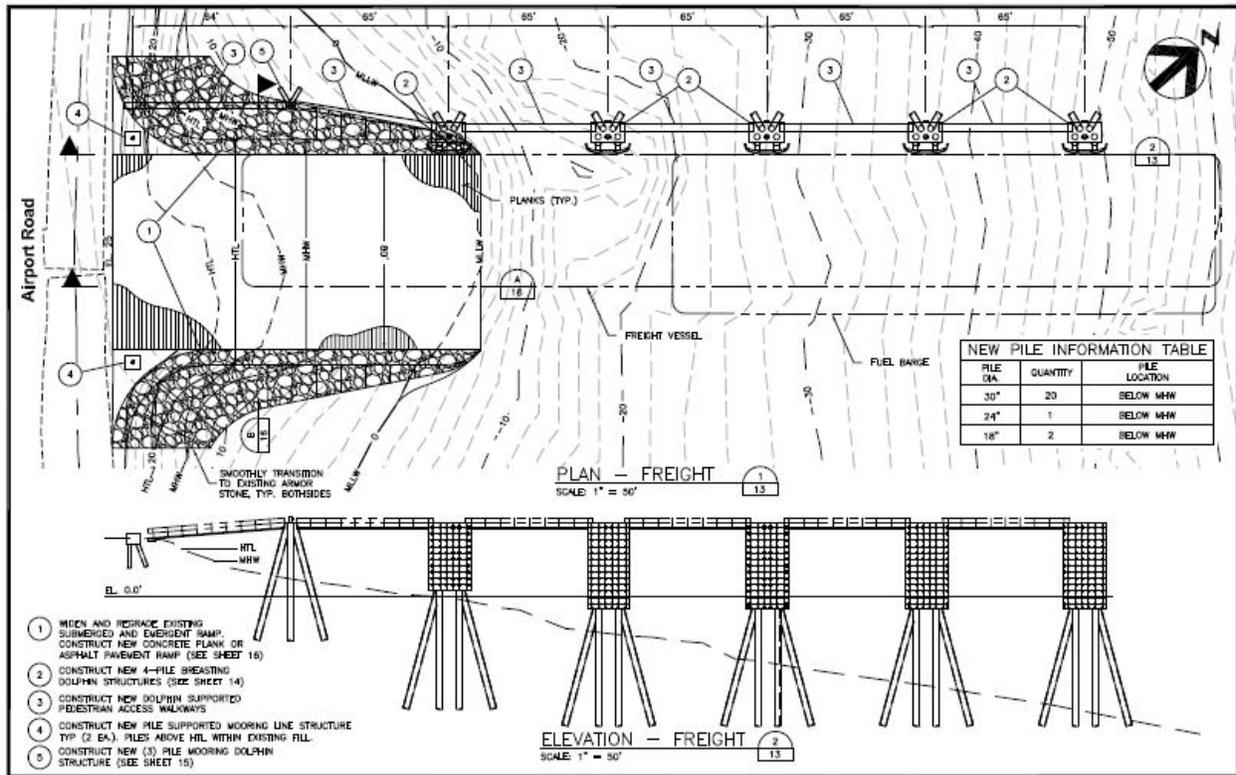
Plan drawing for new Gravina Island Heavy Freight Barge Mooring Facility (Phase 1, Component 4)(HDR 2018b).
